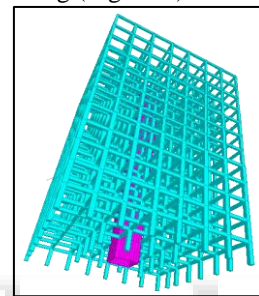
Floating column at 1st intermediate position of columns and shear wall at centre
